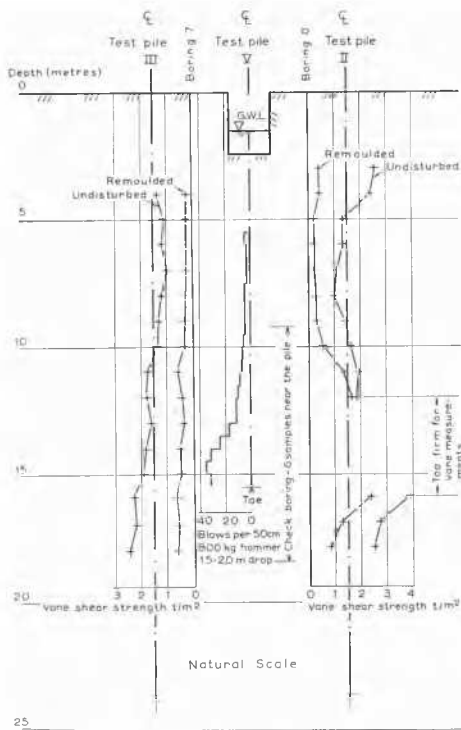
Section through the test pile and the two nearby vane borings 6 and 7.
